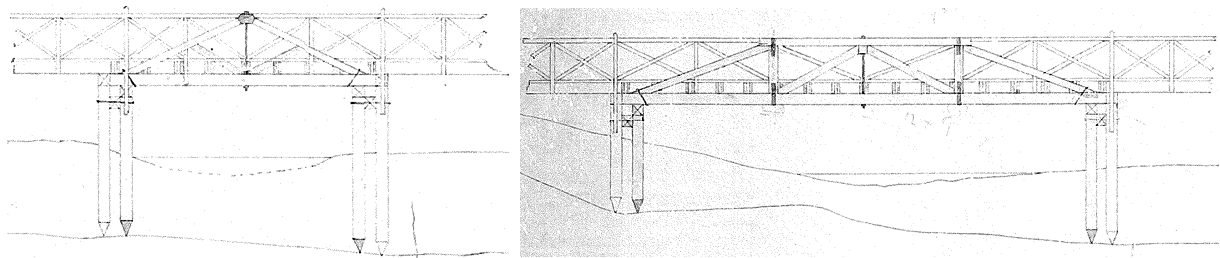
Colonial Architect's King Bolt (left) and Queen Post (right) trusses for Paddy's River (1855)
